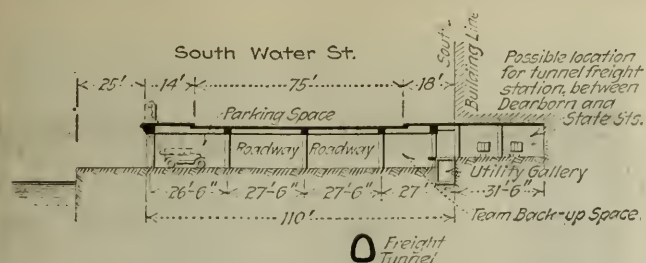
TYPICAL CROSS-SECTION OF DOUBLE DECK STREET
